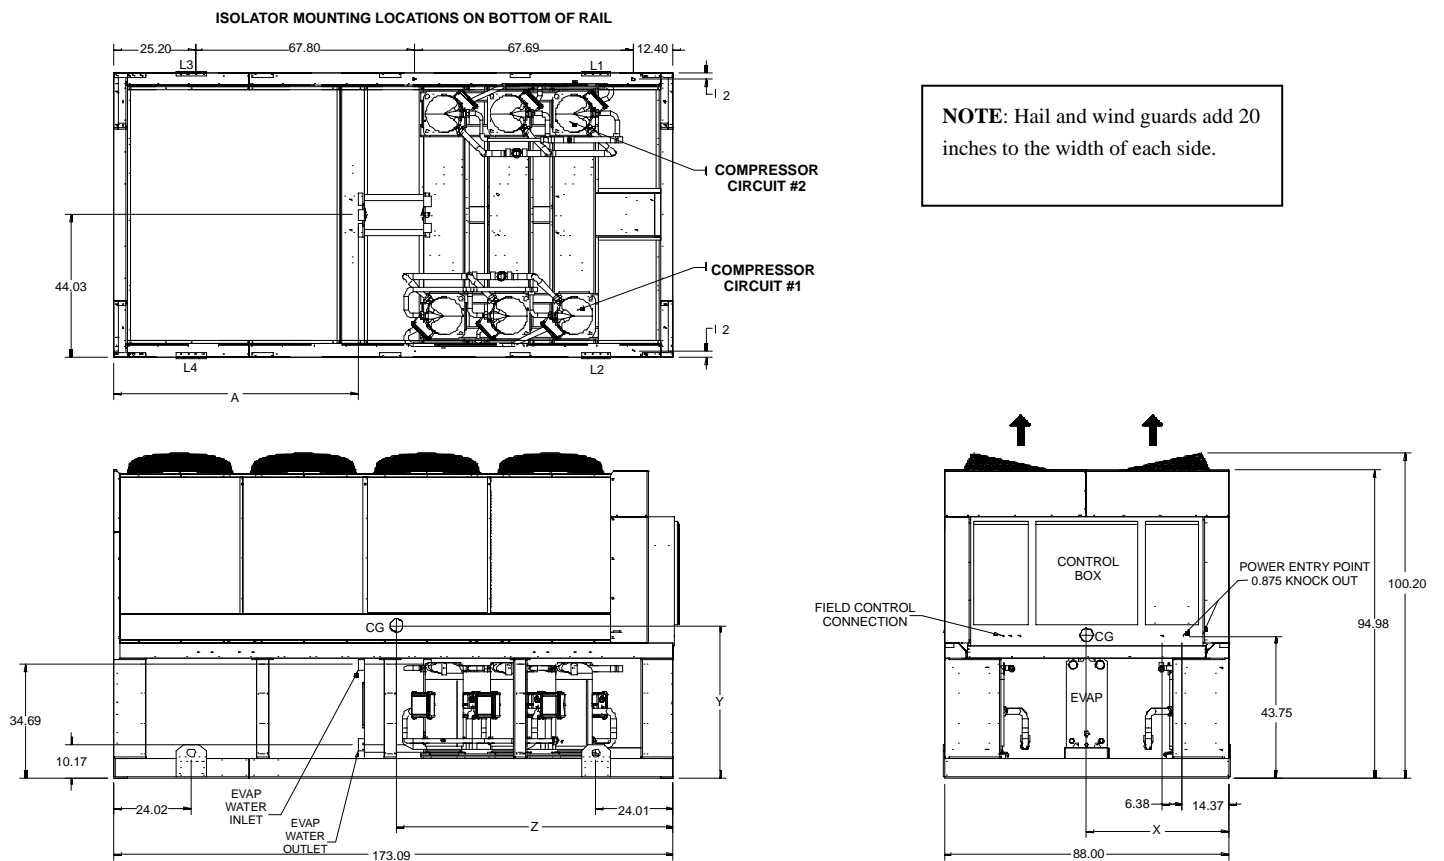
, Dimensions, AGZ 075CH – 100CH Packaged Chiller
